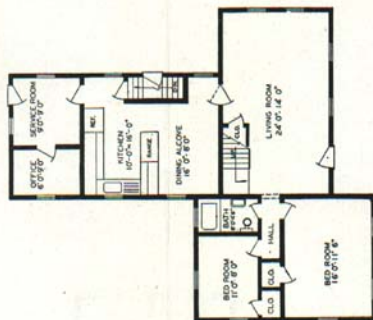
Another remodeled house plan of Fig. 23. Note the convenient kitchen arrangement.
